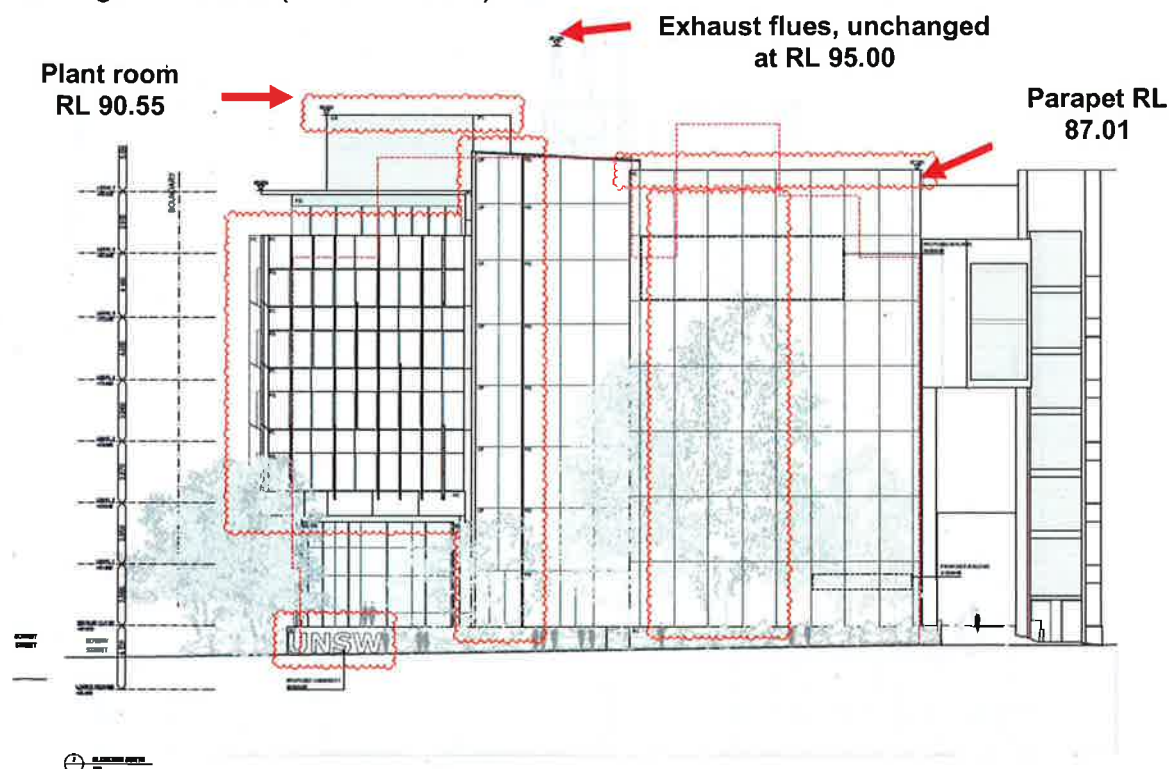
Proposed modifications, northern elevations East (M) & West wings
